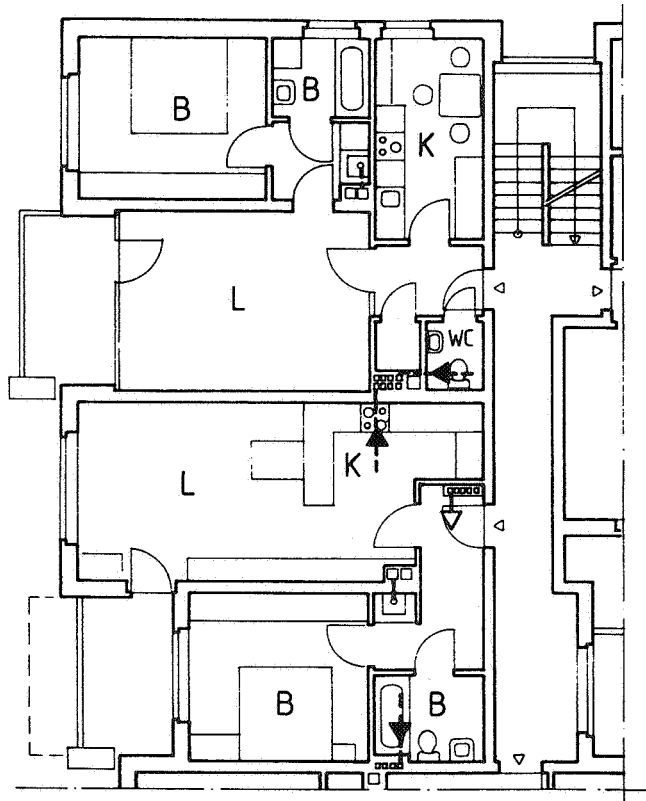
Layout of the test dwelling and neighbouring corner dwelling with arrangement of shafts
